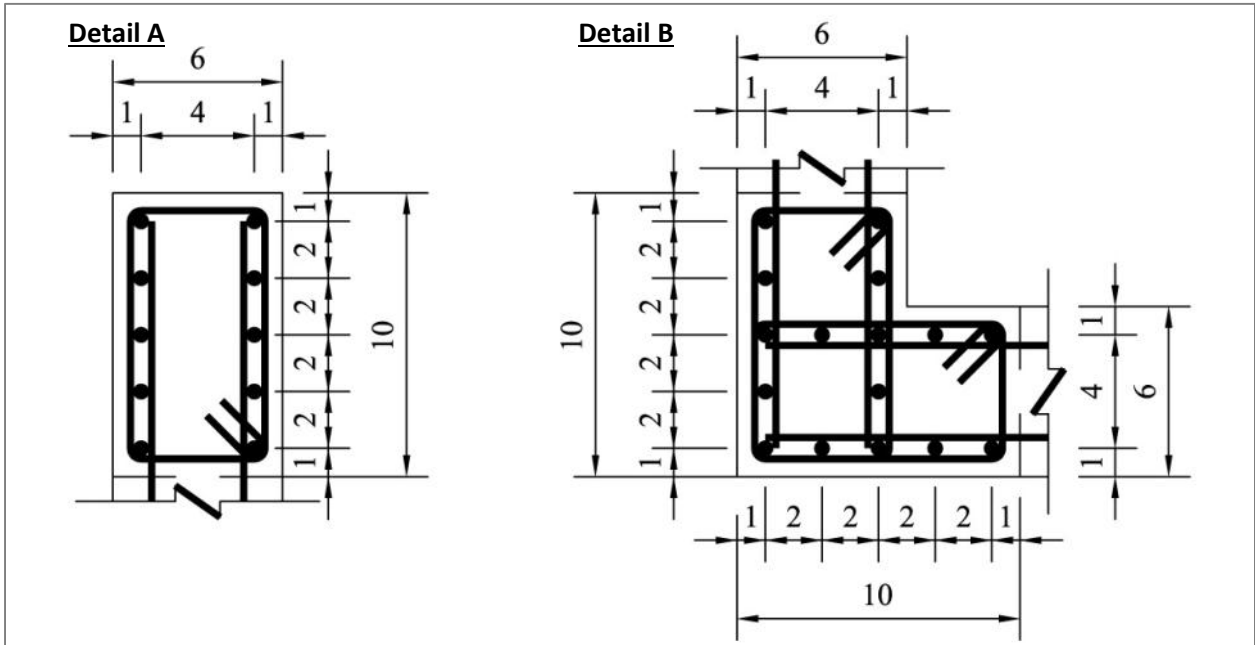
Wall 6 boundary element details without hooks (dimensions are provided in inches)
